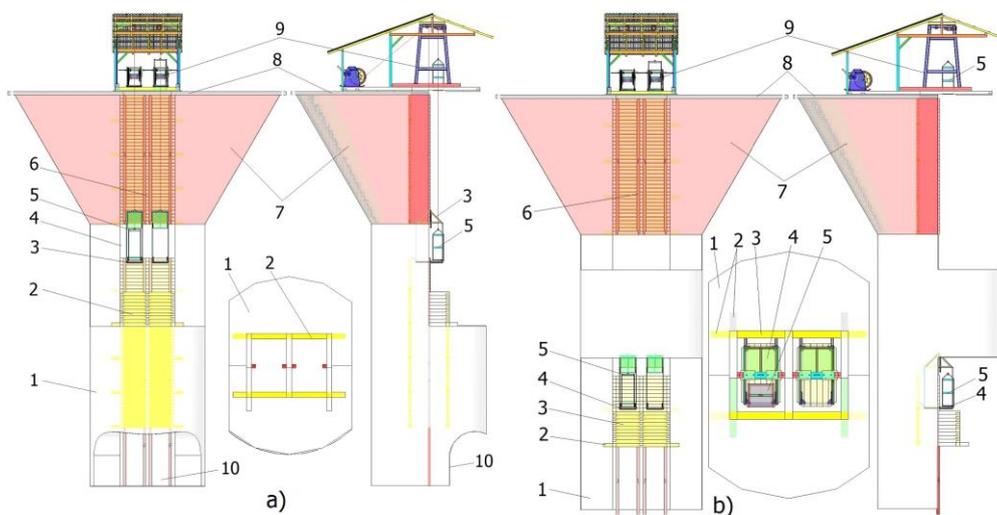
The way of using the equipment for the Carol shaft rehabilitation, by changing the wooden armature with excavation, variant IV, stage 1 and 2.
